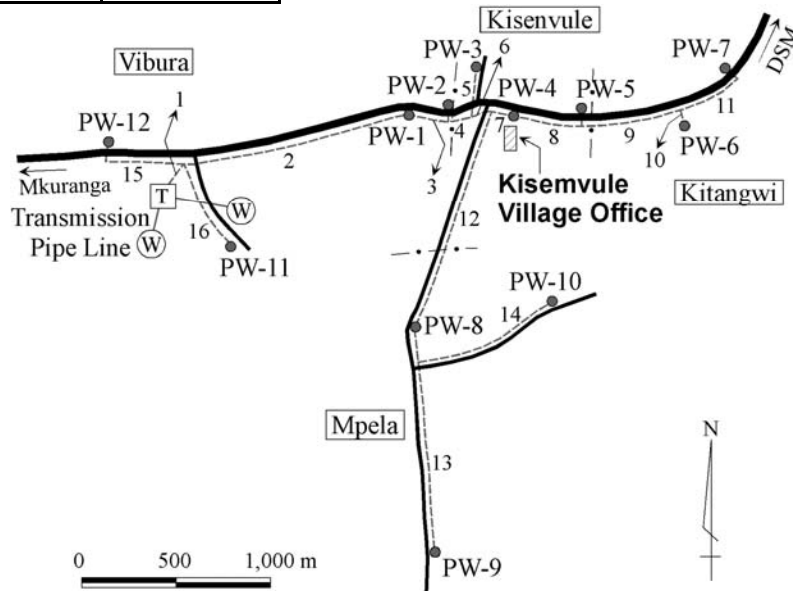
LAYOUT OF WATER SUPPLY SCHEME (KISEMVULE: MKR-3)
